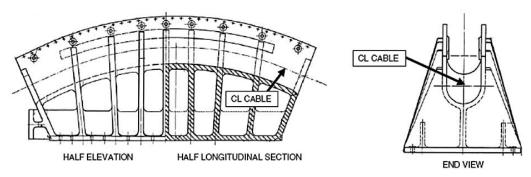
Elevation (left) and Cross-Section View of a Typical Saddle (right)
